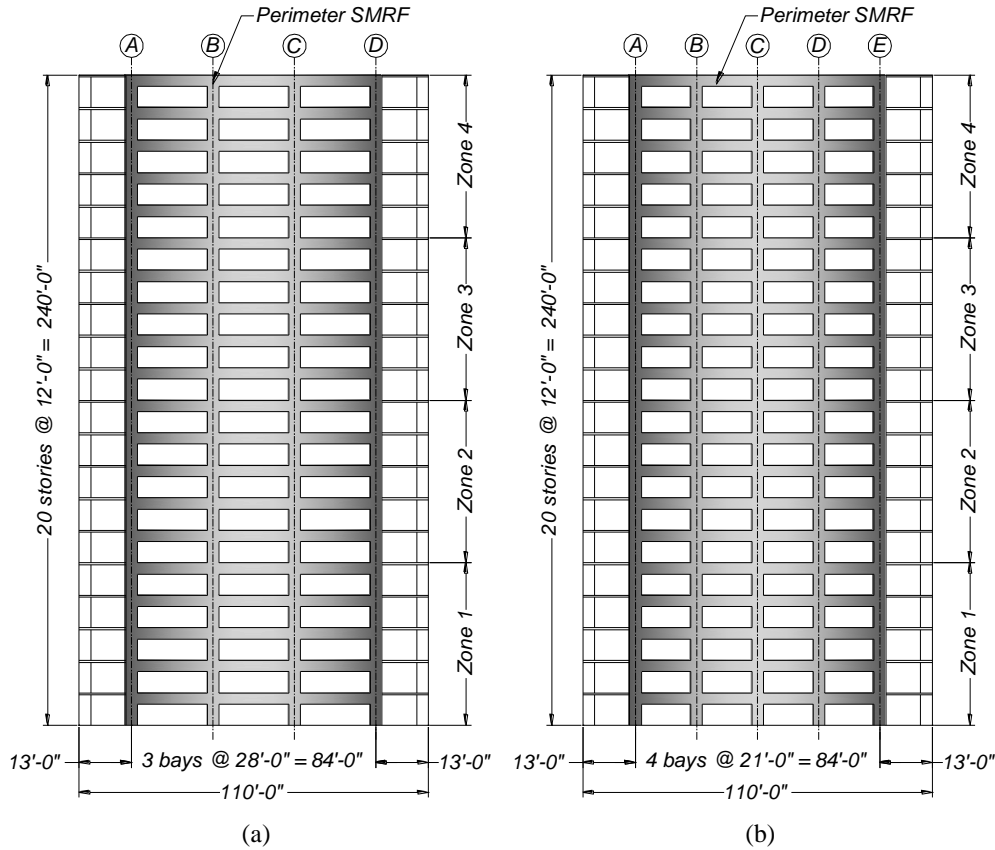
Elevation of 20-story archetype buildings: (a) A20-3 and (b) A20-4.
